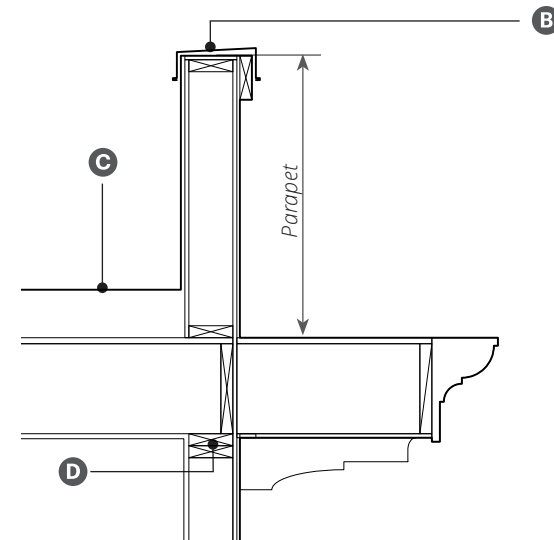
D Section detail of Highest Top Plate for parapet and flat roof.
